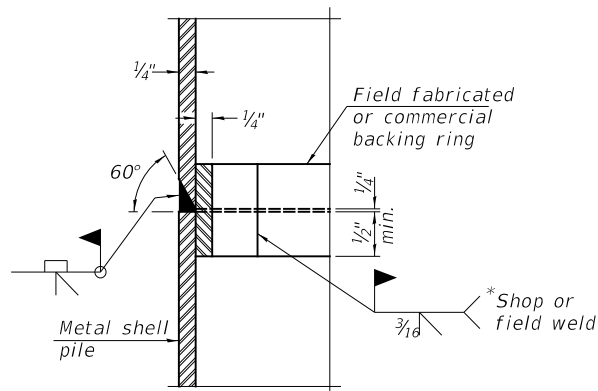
DETAIL OF METAL SHELL PILE ENCASEMENT AT ABUTMENTS
